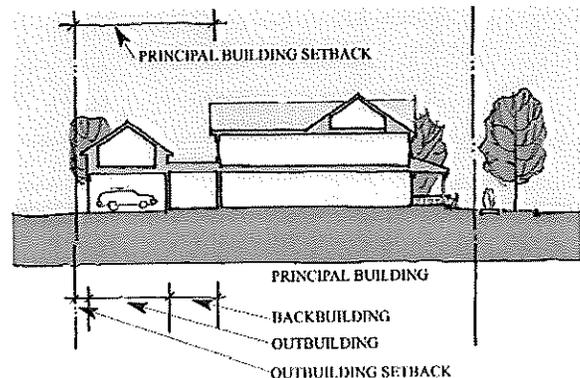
A typical Village lot is shown with principal building, back-building, and outbuilding.
